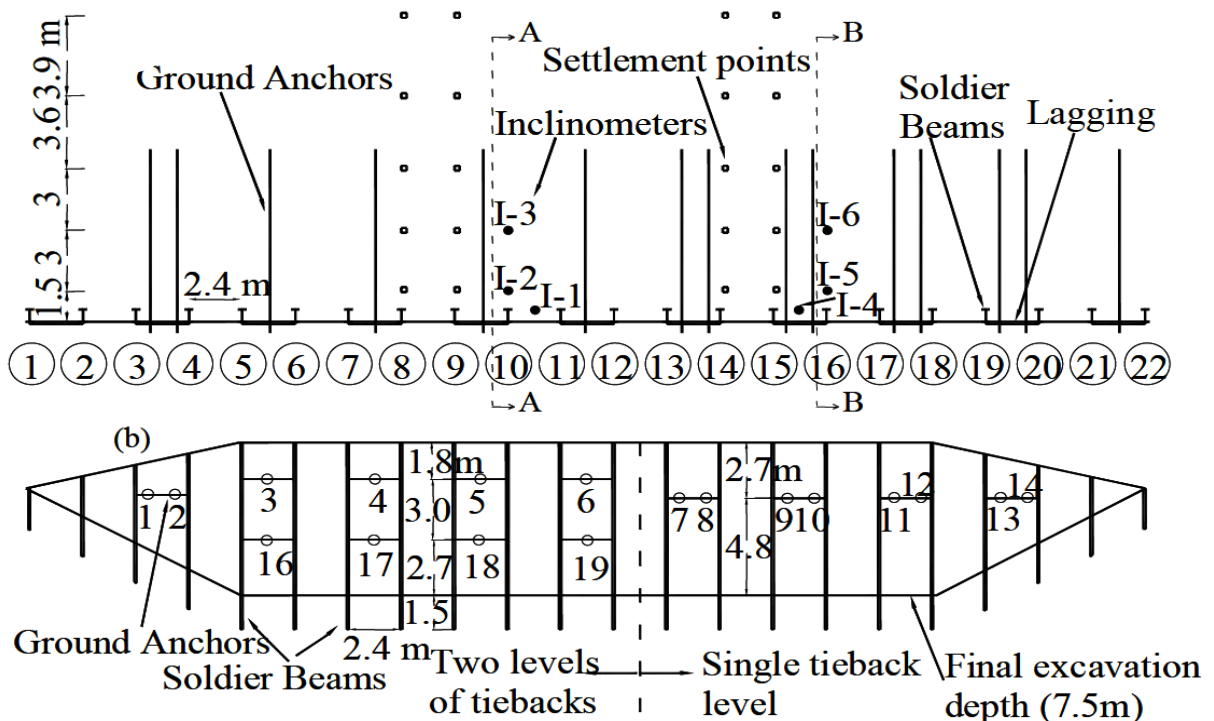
Schematic of Texas A&M University full scale model excavation site showing a) Plan view and instrument locations. b) Elevation view of the wall, inclinometer labels introduction in this study[15]
